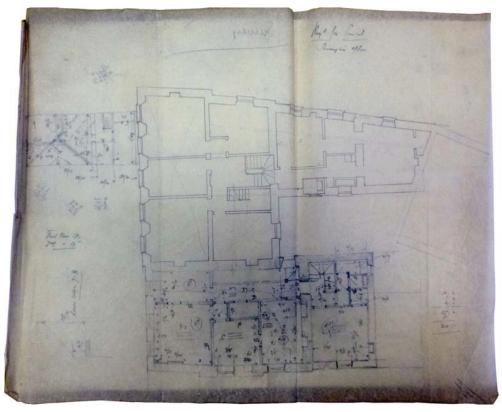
Sketch of the first floor, dated c1903 (CAC(B) Z/1028/1 c1903)
